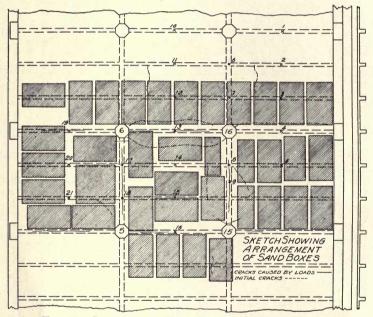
LOCATION OF SAND BOXES AND FLOOR CRACKS.
